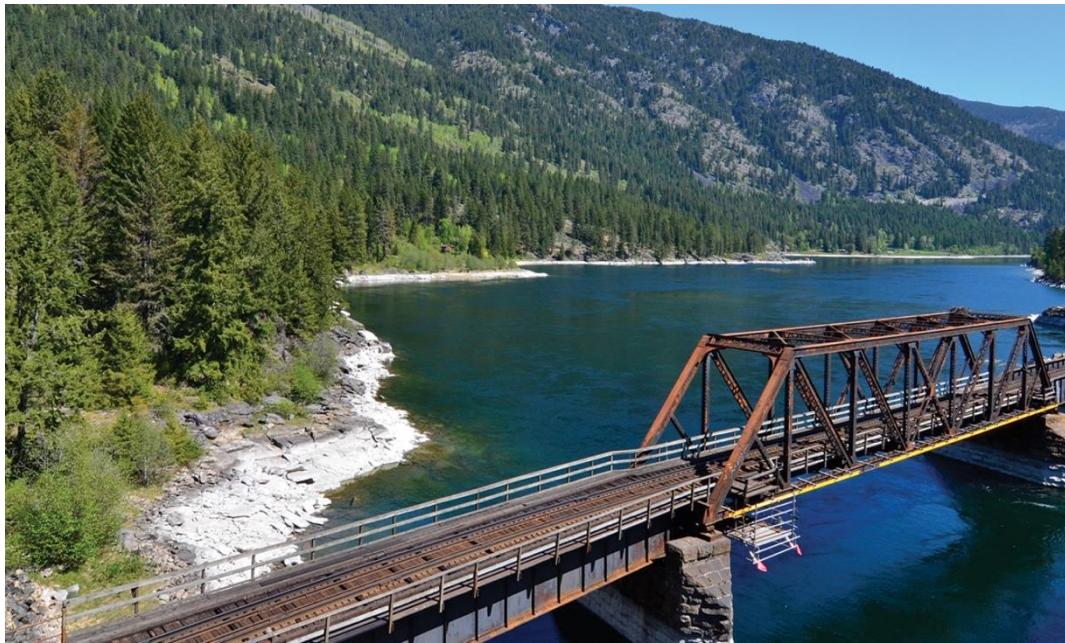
Railway bridge adjacent to Taghum Bridge.²⁵
